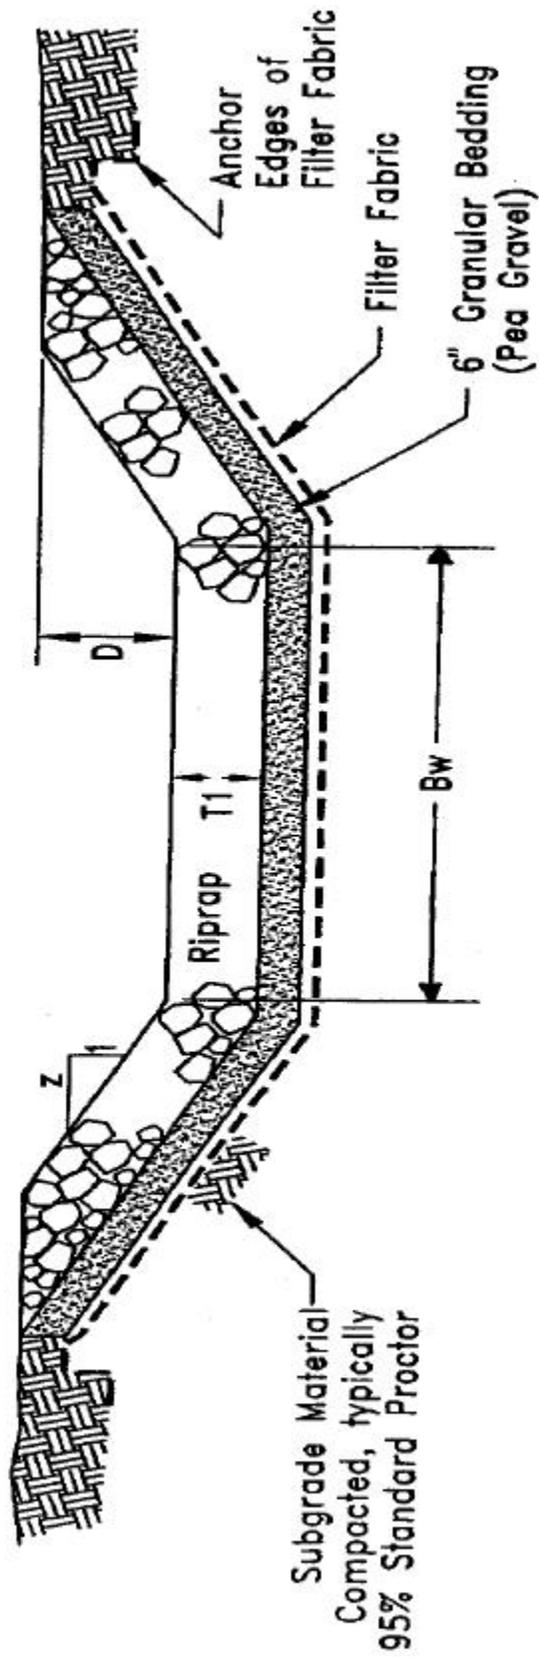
Typical Rock Riprap Drop Structure - Cross Section View
